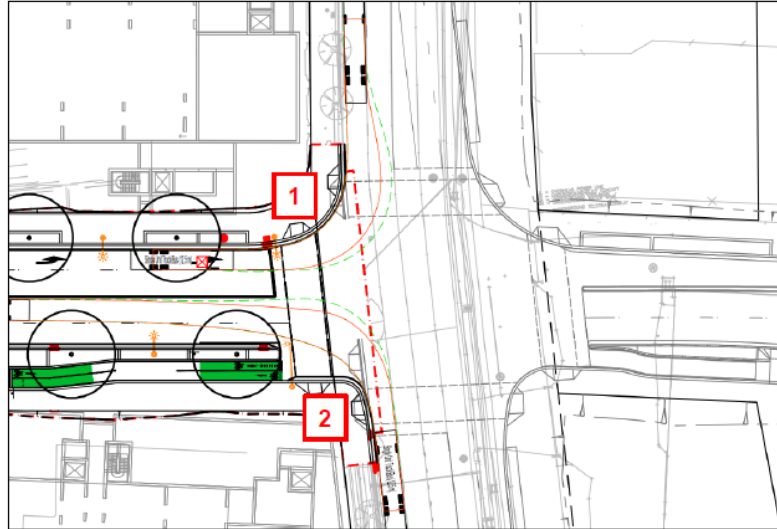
Vehicle tracking for the Connector Road – O'Riordan Street intersection
